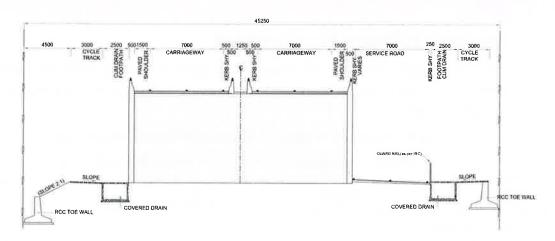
Typical Arrangement of Spur to Bahadurgarh at NH-10 Interchange.
